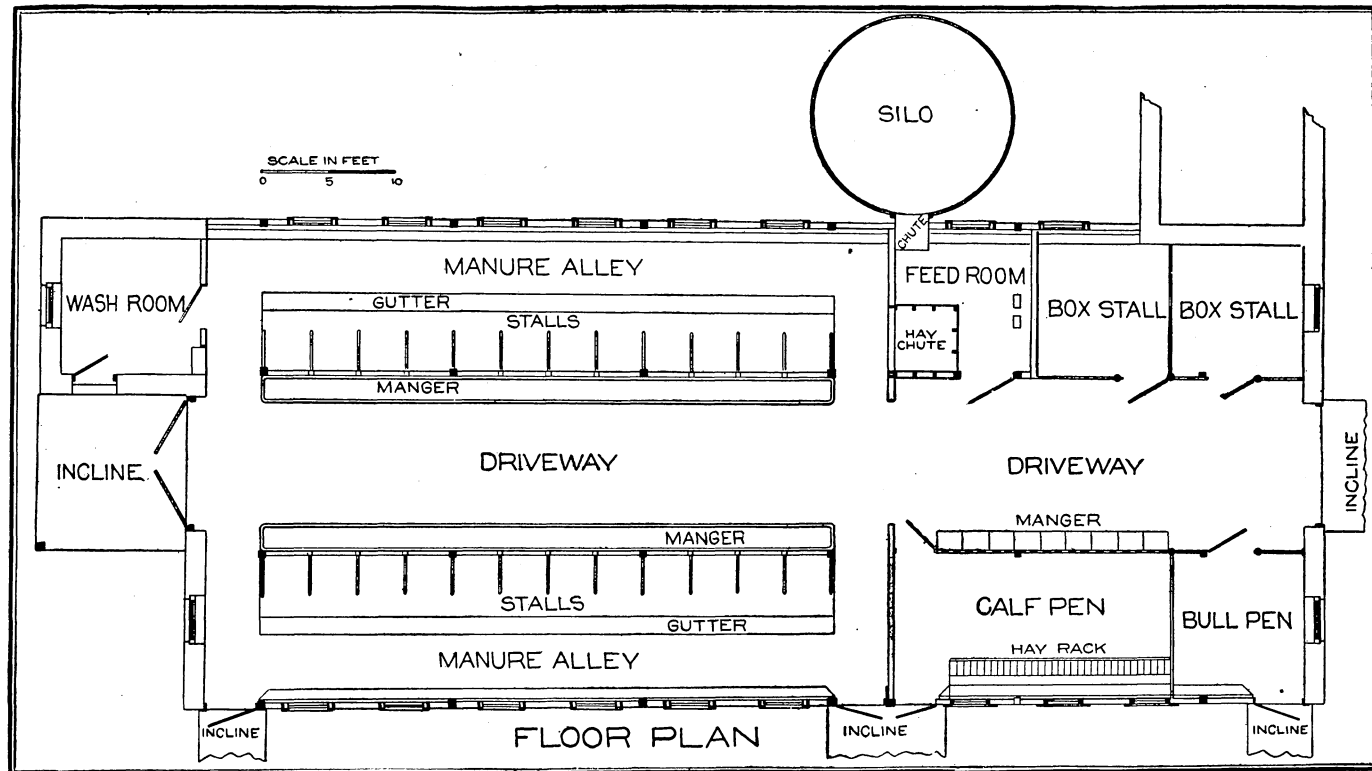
Floor plan of modern dairy barn for 24 cows.
